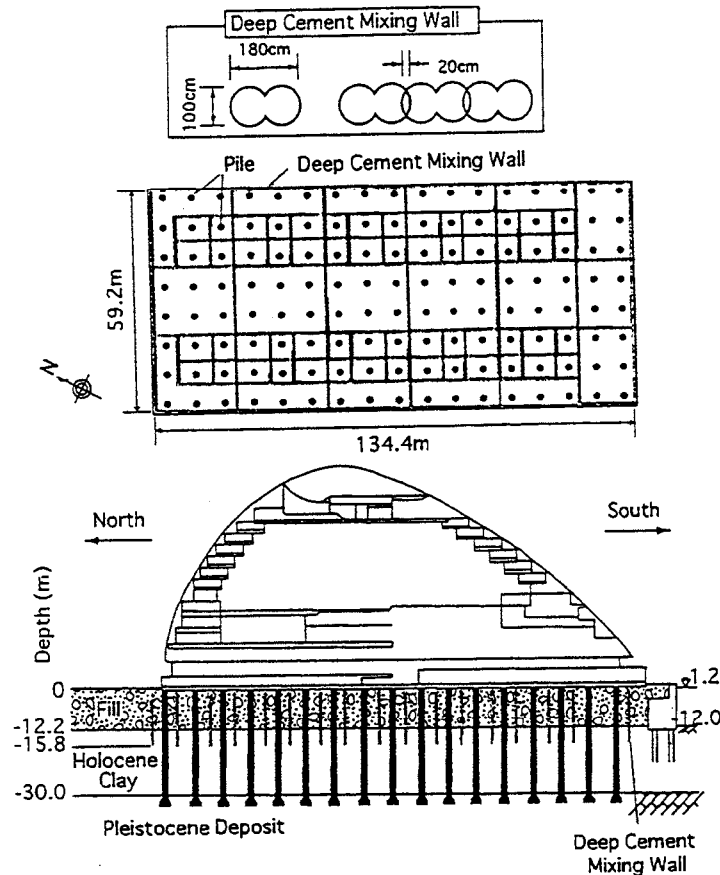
Section and plan of foundation of Oriental Hotel⁵⁾
